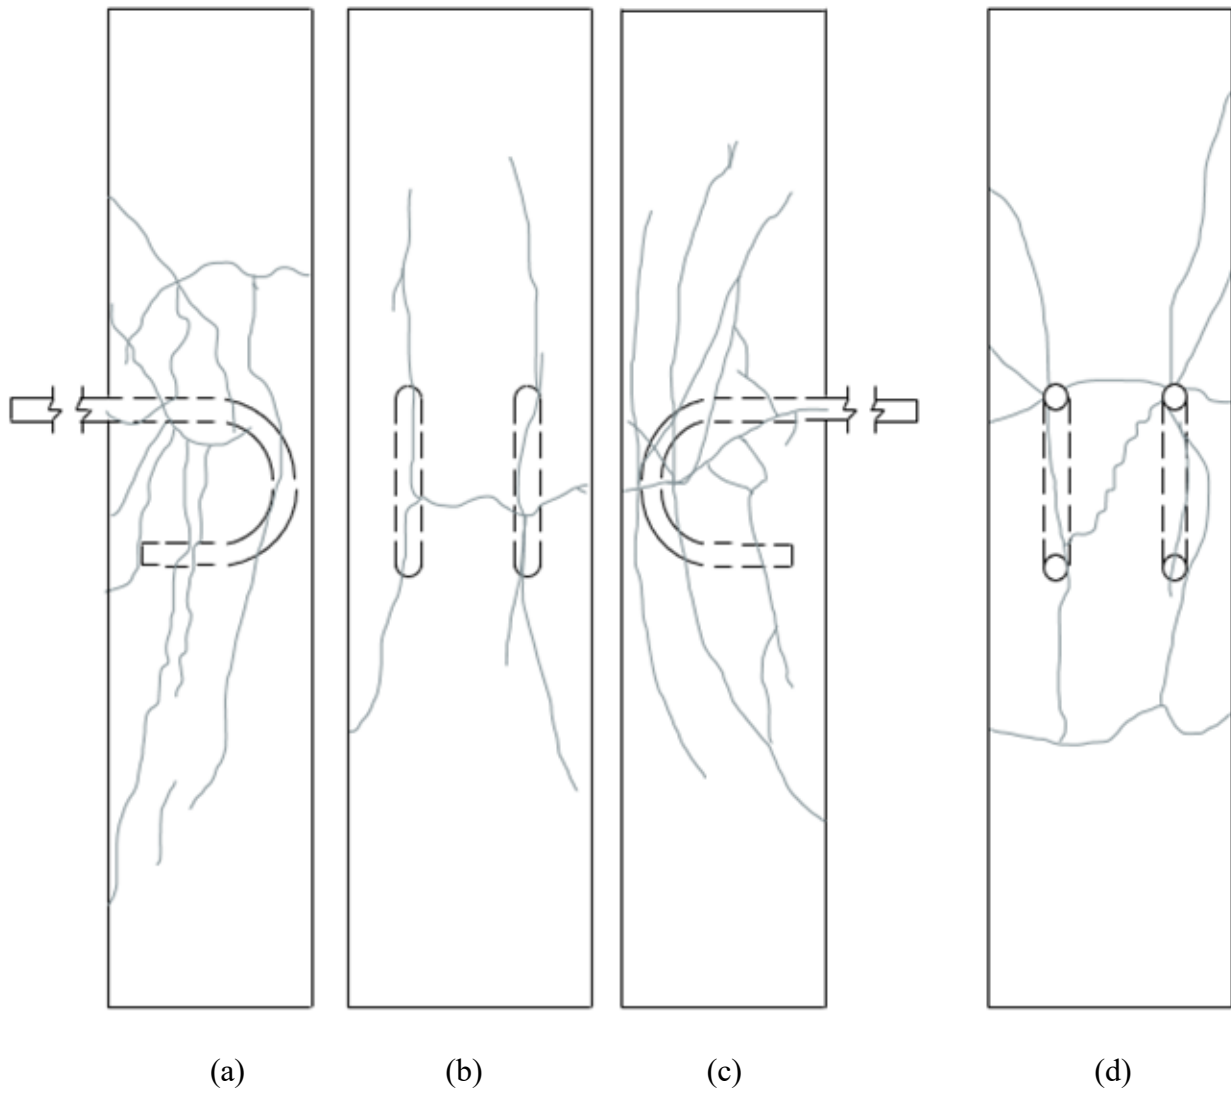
Crack pattern at maximum normalized tensile load for beam-column joint specimen P5-180: (a) west side face, (b) back face, (c) east side face, and (d) front face
